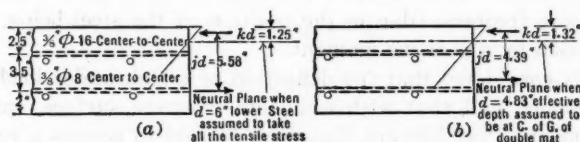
ANALYSIS OF REINFORCED CONCRETE LONGITUDINAL PAVEMENT SECTION.
